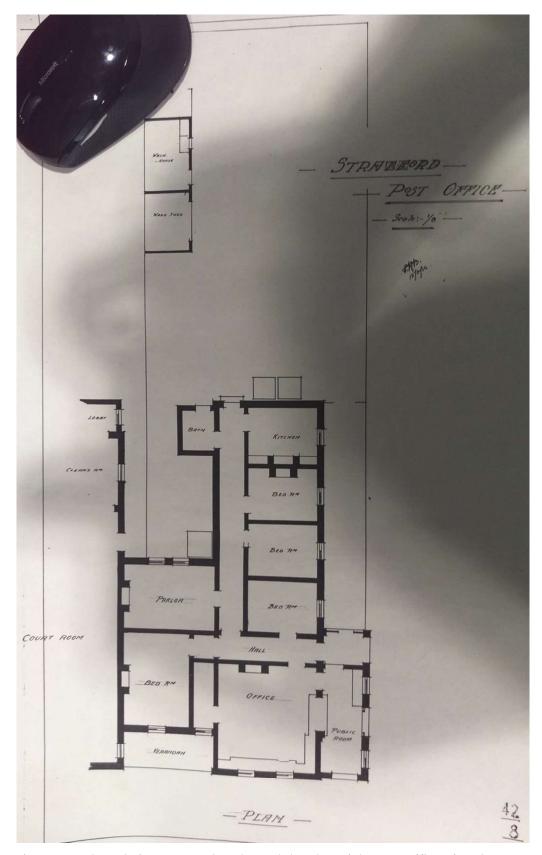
Plans dating to 1916 that showed the plan of the post office after the c1900 additions to the office and public room (Saleta 2016).
